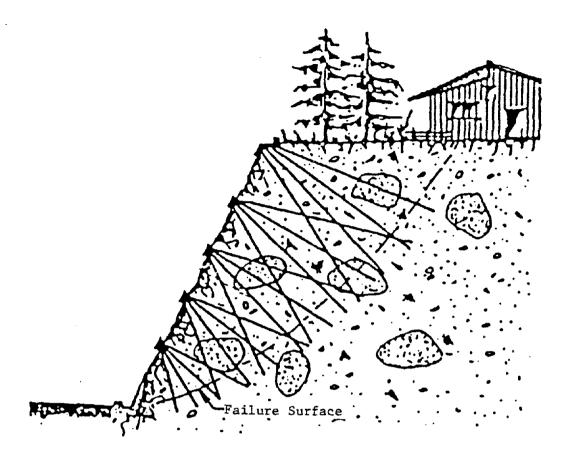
Schematic cross section illustrating the use of root pile for stabilization of a slope (after Lizzi, 1977)
